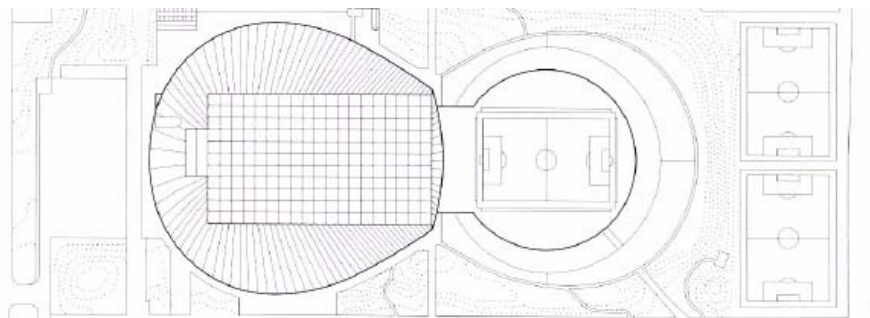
Sapporo Dome*, Japan: Ground plan [64]
